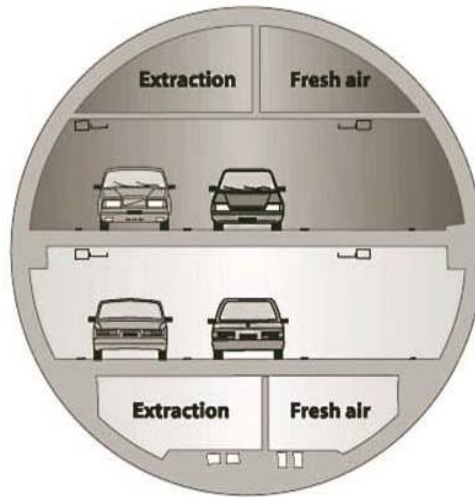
A-86 Road Tunnel in Paris, France (FHWA, 2006)
